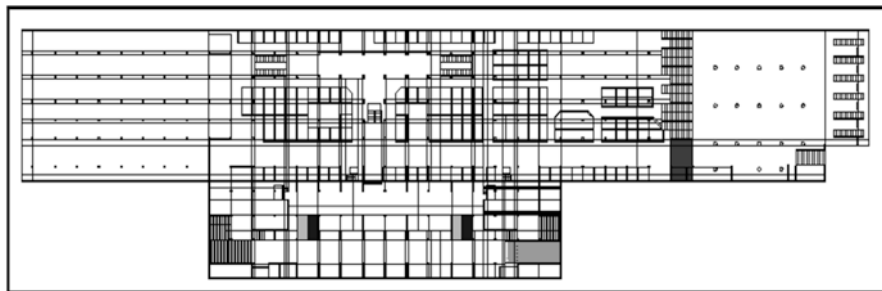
Construction drawing of Blok M mall building at B1 floor
